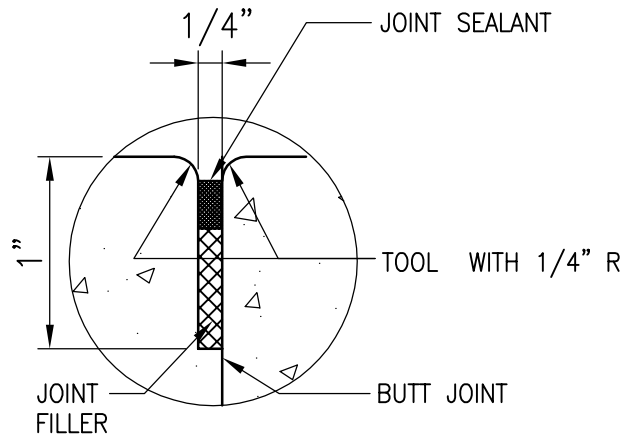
CONCRETE PAVEMENT JOINTING (TYP.)
